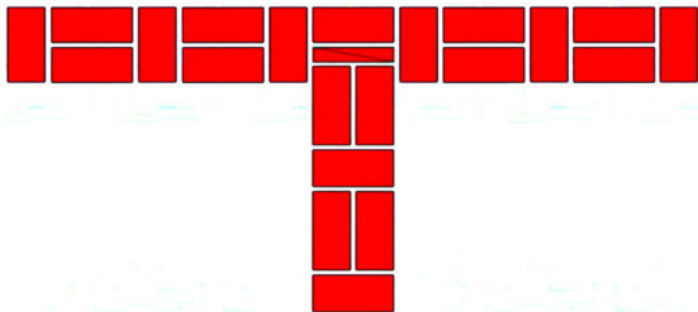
The order of laying bricks in a section of walls between window openings. Wall thickness 2 brick.
